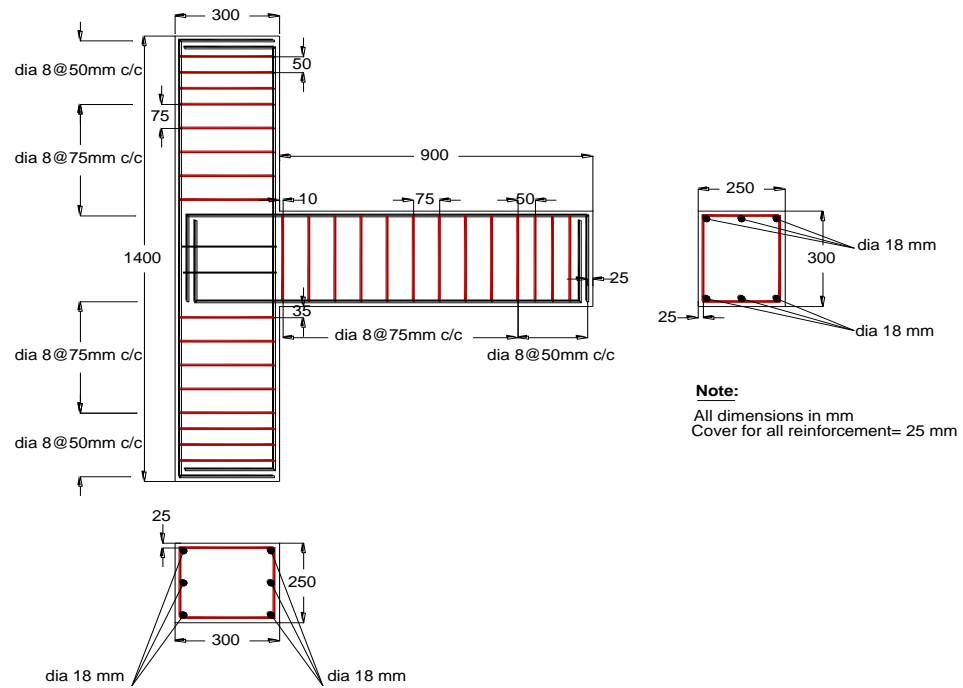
BCJ-18 MM specimen reinforcement details and dimensions [17]
